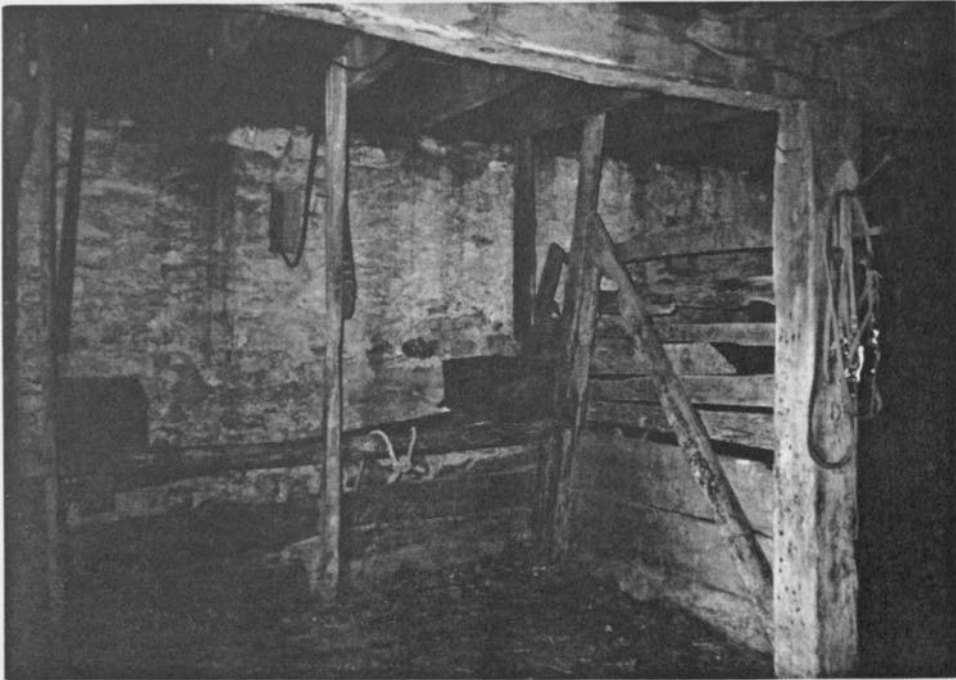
Feed bunks and small wall openings, central Grimm barn
